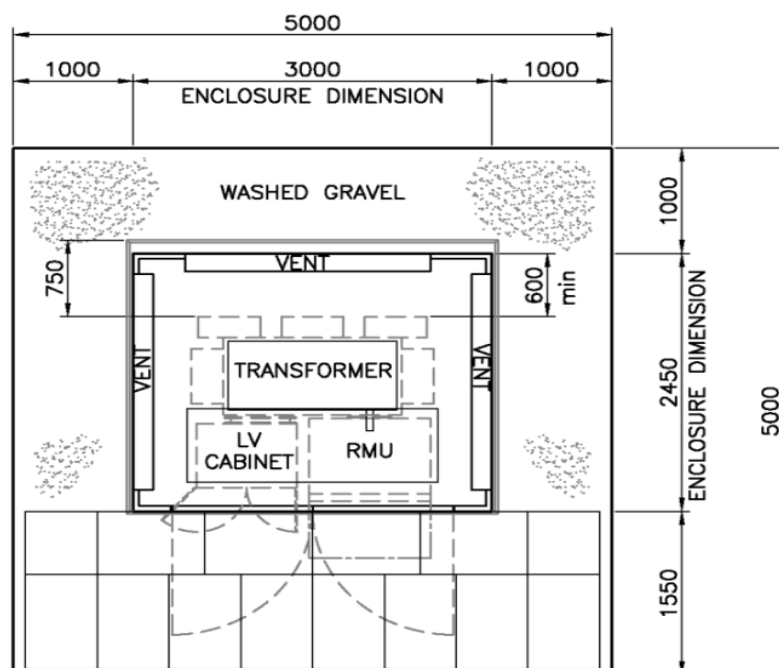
Conventional secondary substation layout [2] (\*All units are in mm)
